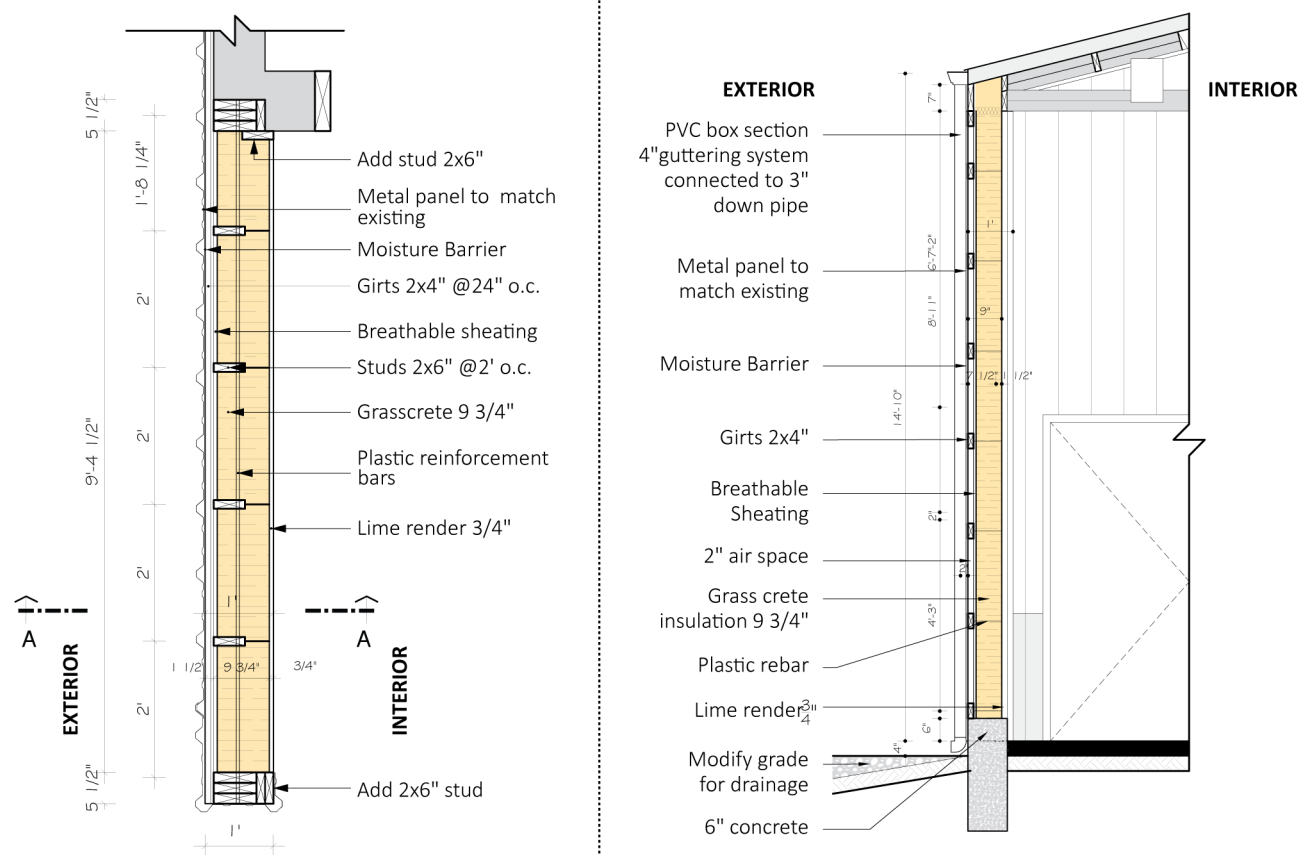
Grass-crete detail: plan view (left image) & section view (right image). Flores F.
